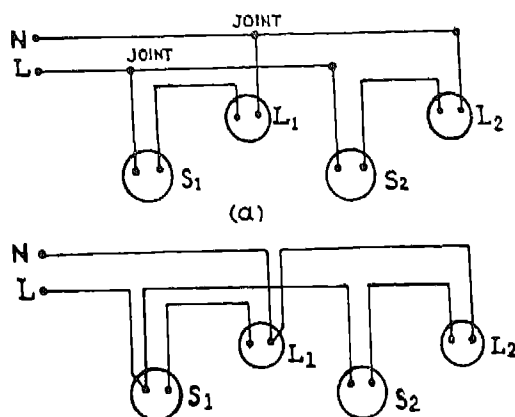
Wiring with Joints and 'Loop-in' Connections
